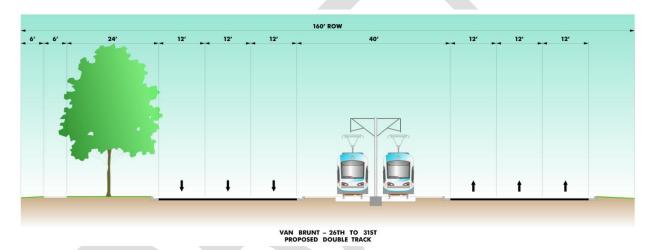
Enhanced Streetcar Truman Road Alignment Typical Section - Van Brunt from 26th to 31st
